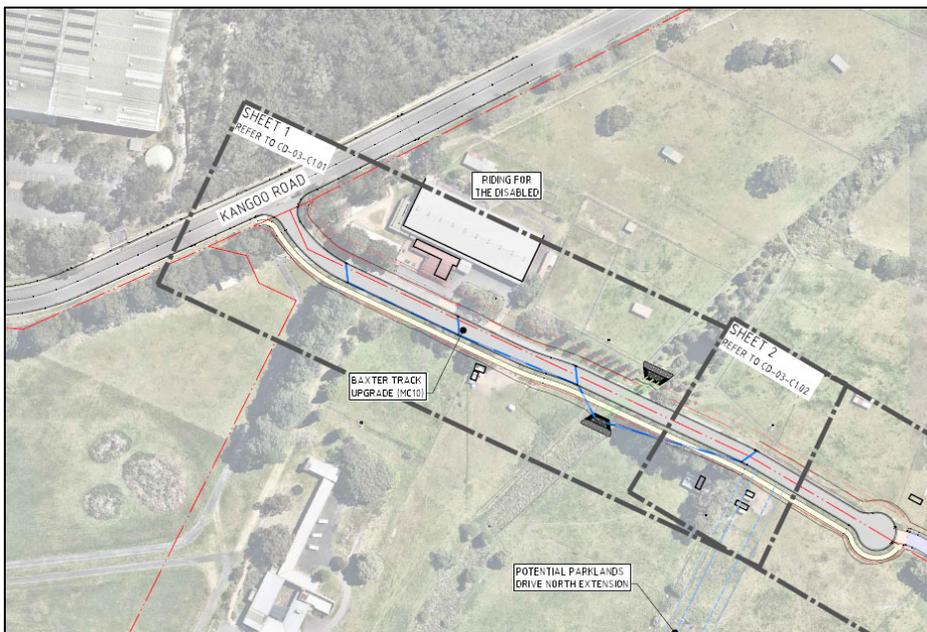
Concept design layout, Kangoo Road / Baxter Road
